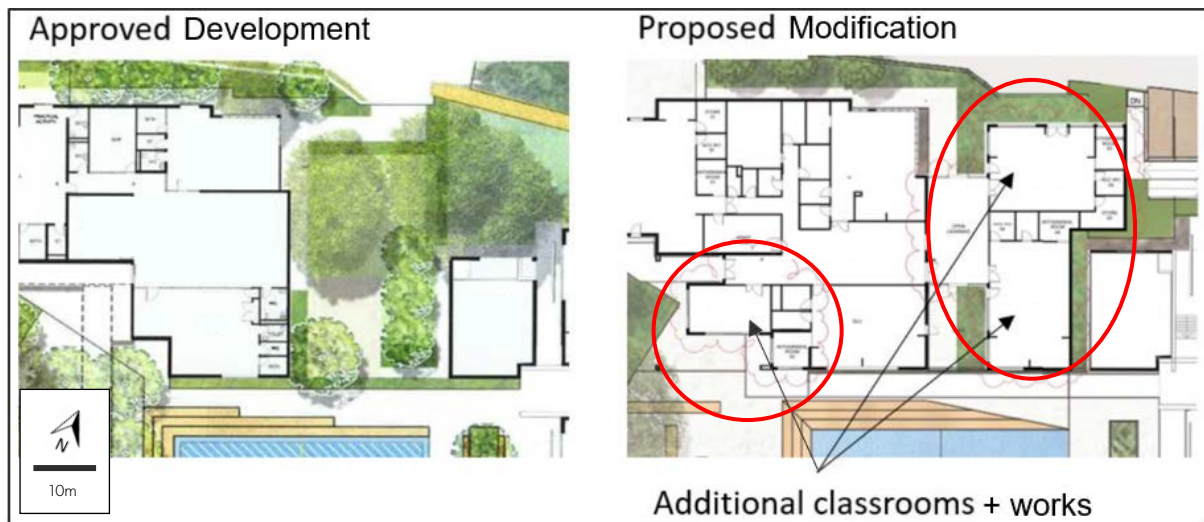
| Approved and proposed special education building (source: Section 4.55 Modification Application, 2019)
